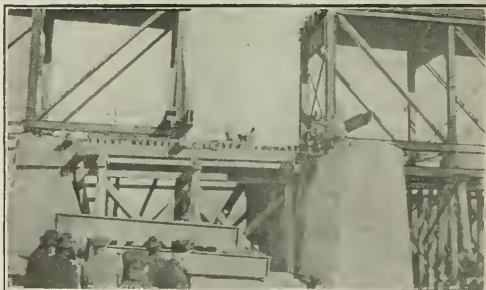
MOVING TRUSS SPANS ON SANTA FE RY.
